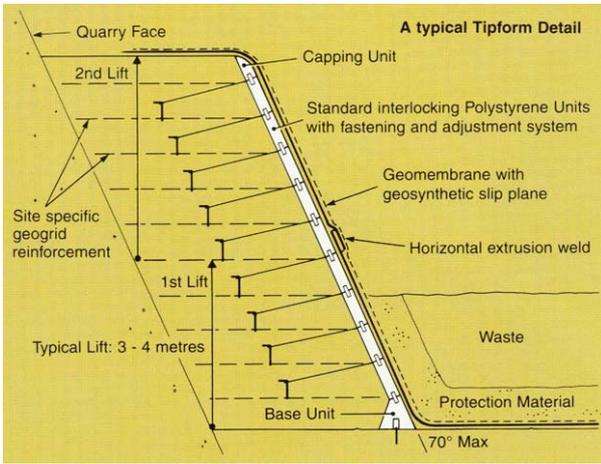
Typical construction detail for reinforced soil with polystyrene facings steepwall system.
